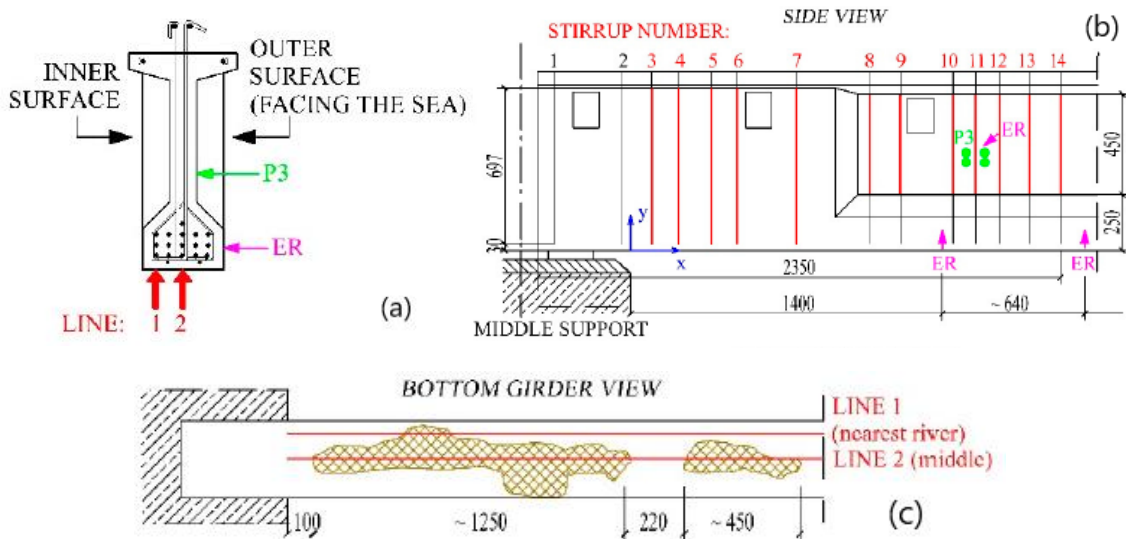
(a) Bottom flange of girder 2; (b) Side view of girder 2; (c) Bottom view of girder 2 [11]
